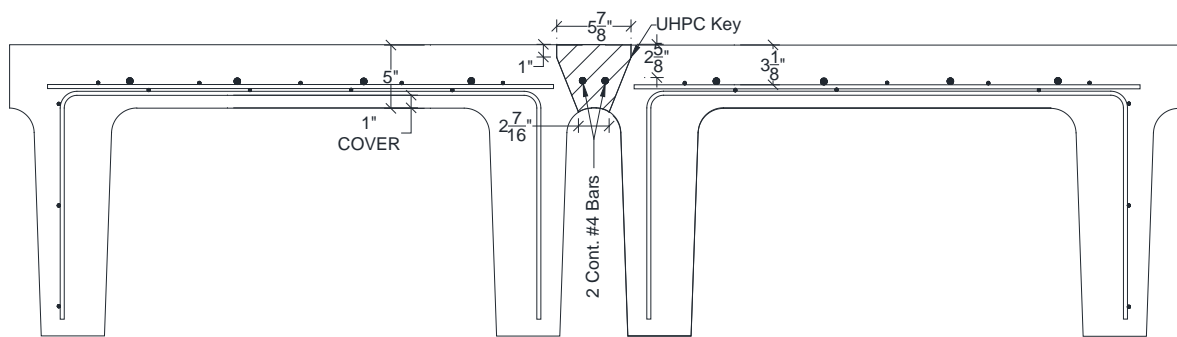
Proposed UHPC Intermediate Pocket Detailing
